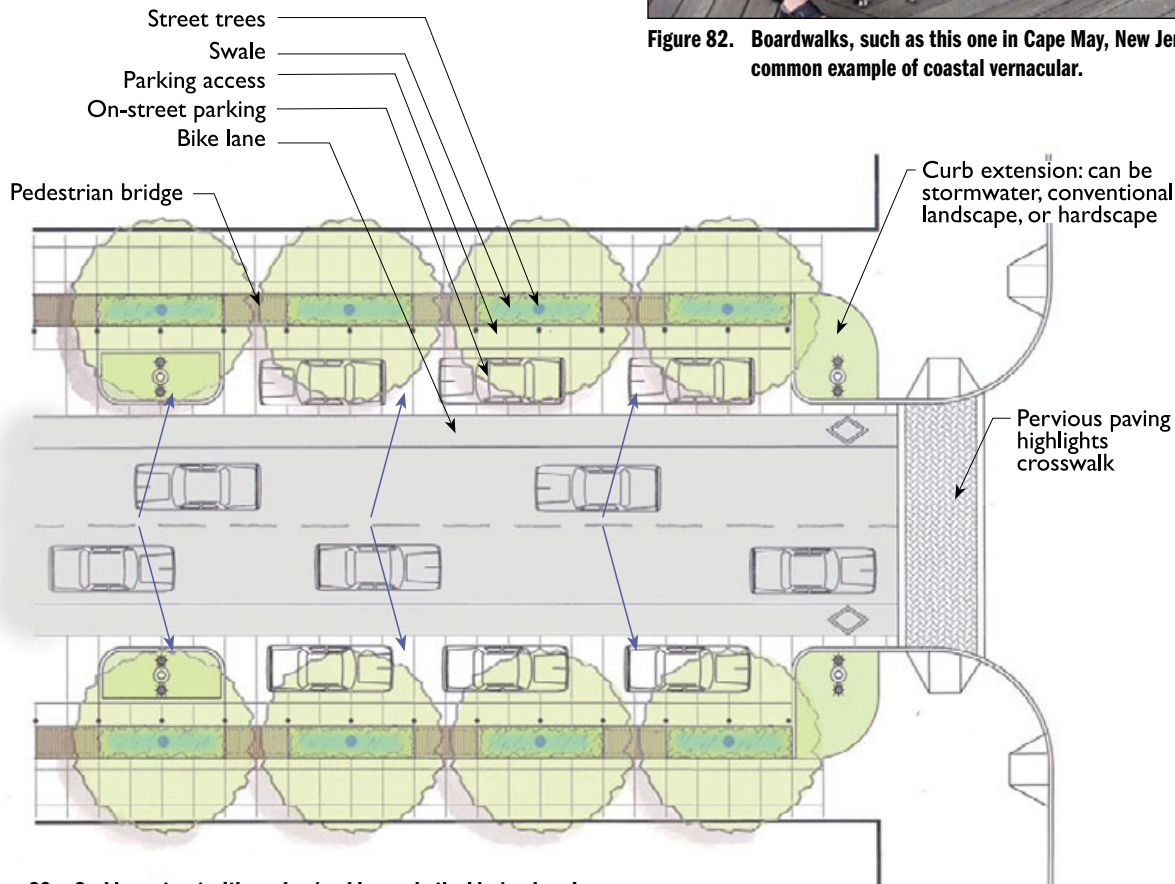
Curbless street with swales (parking on both sides)—plan view.
